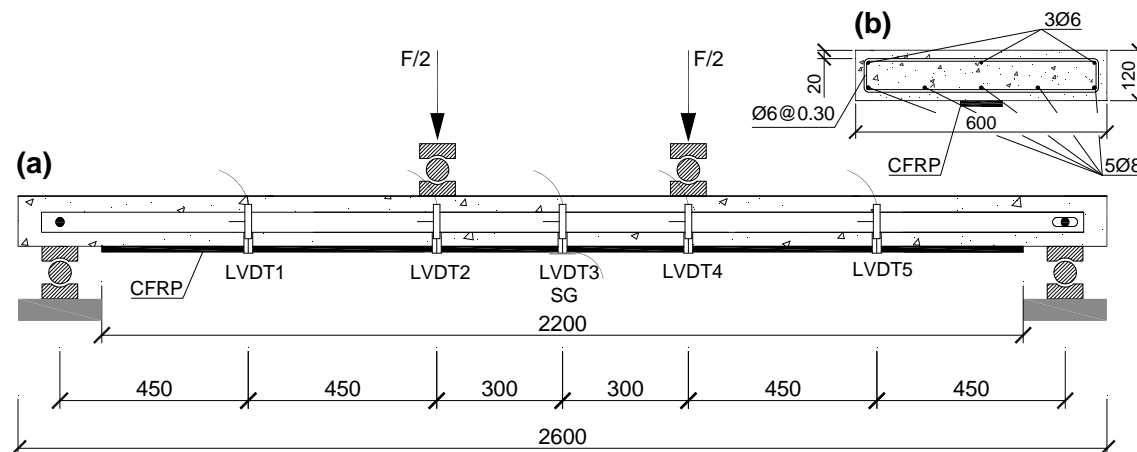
Slab geometry and testing configuration (all units in (mm)).
